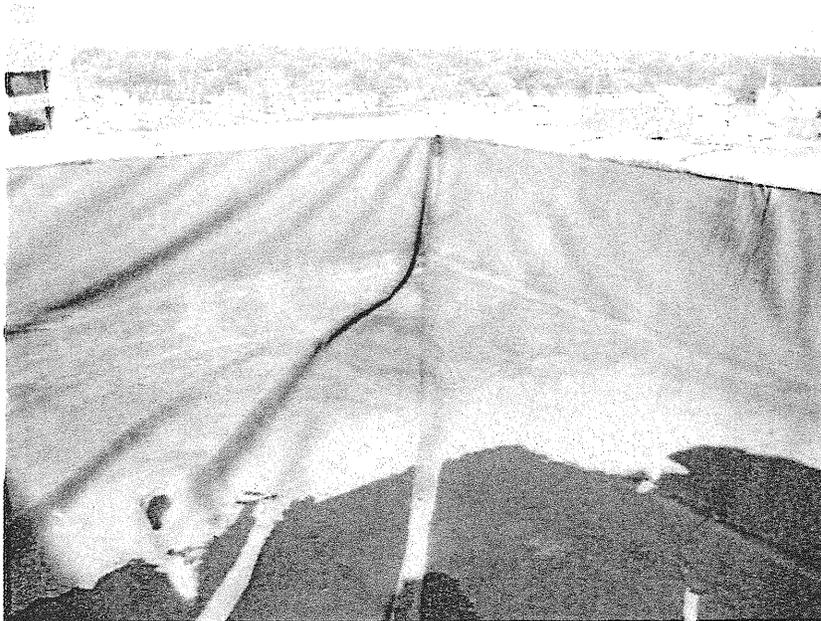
Partial view of EPDM membrane roofing at the six-story portion of the building showing the membrane detached from the parapet.
